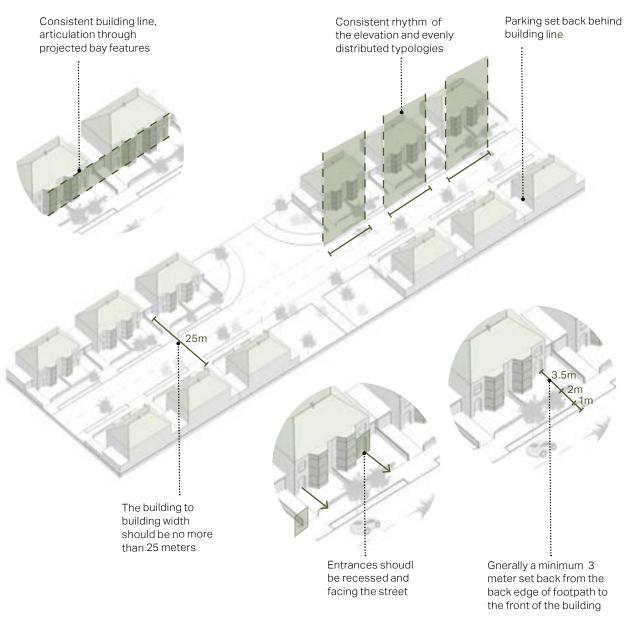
Diagram illustrating Area 3 Built Form Design Codes including Building Lines, building to building dimensions and entrances
